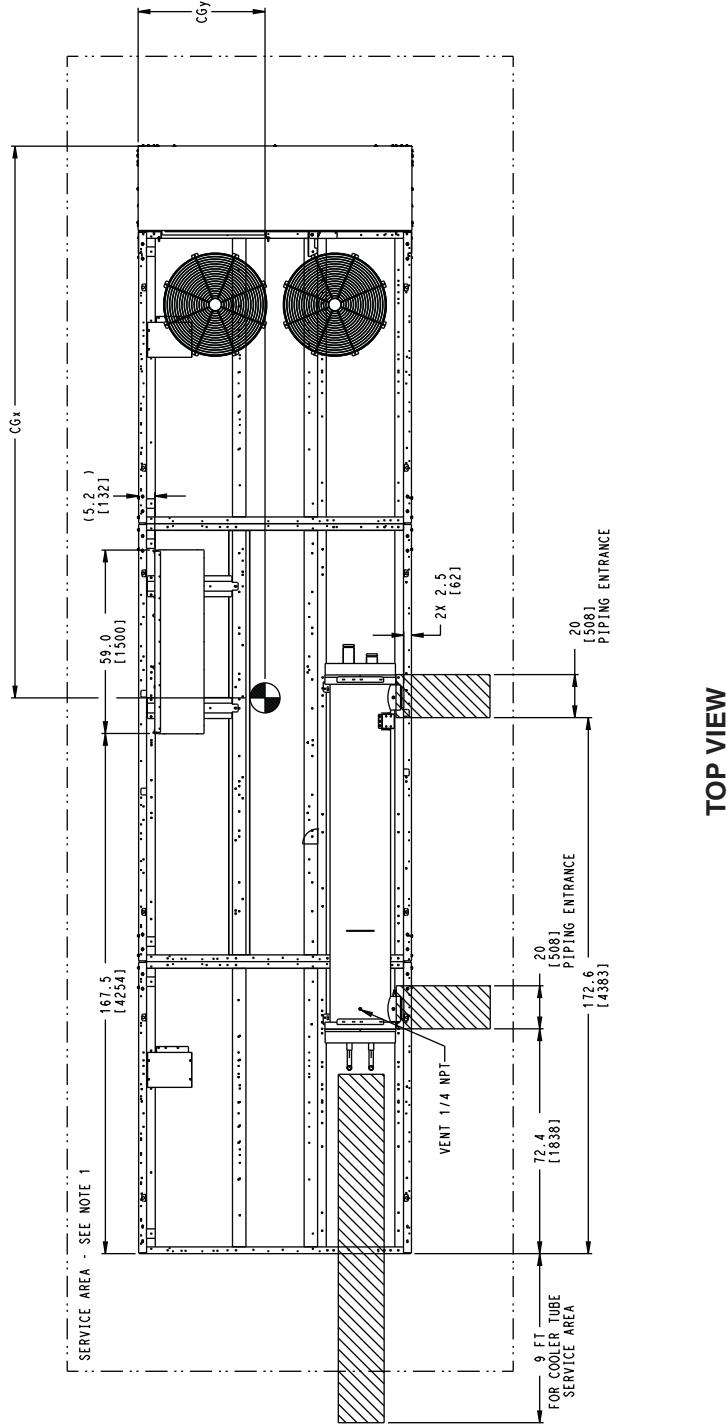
30XA182,202 Air-Cooled Liquid Chiller Dimensions (DX Cooler) (cont)
